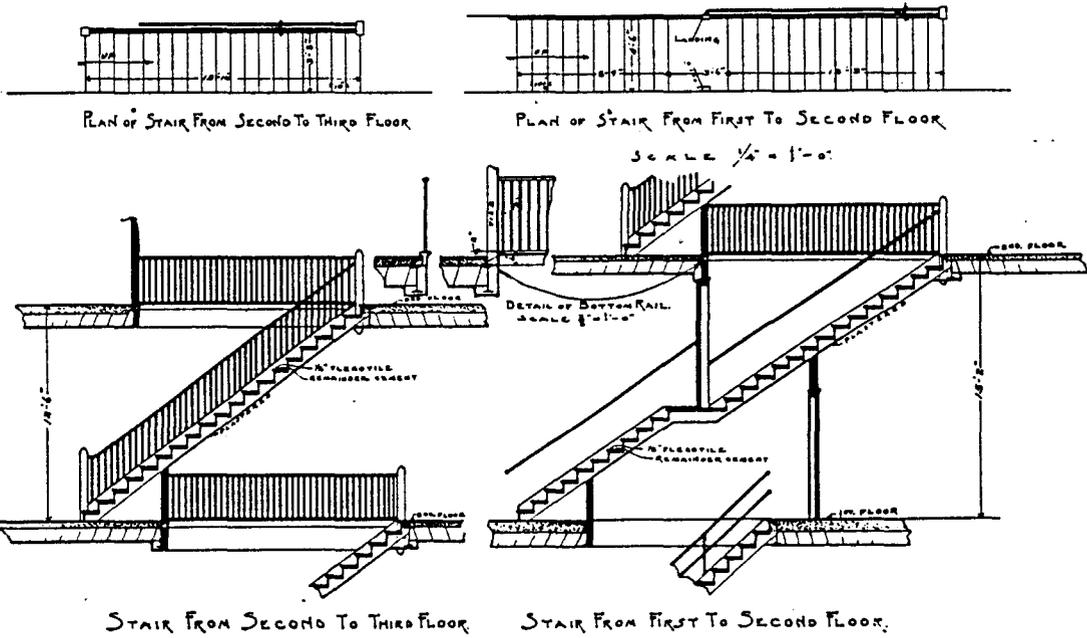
DETAILS OF STAIRS FOR LODGING HOUSE AT
